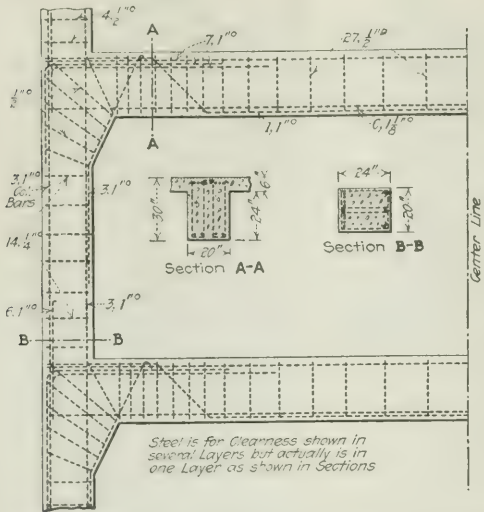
REINFORCING DETAILS AT RIGID CONNECTION OF BEAM TO COLUMN
